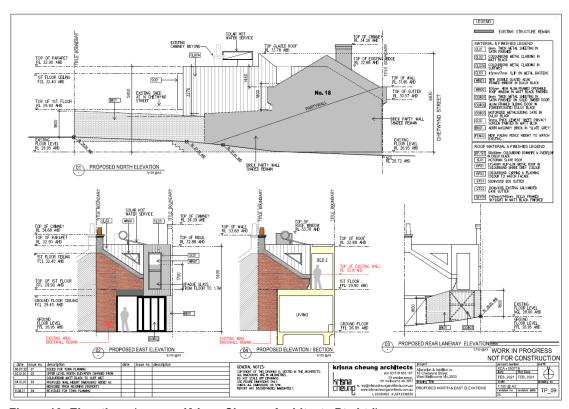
Elevations (source: Krisna Cheung Architects Pty Ltd)
